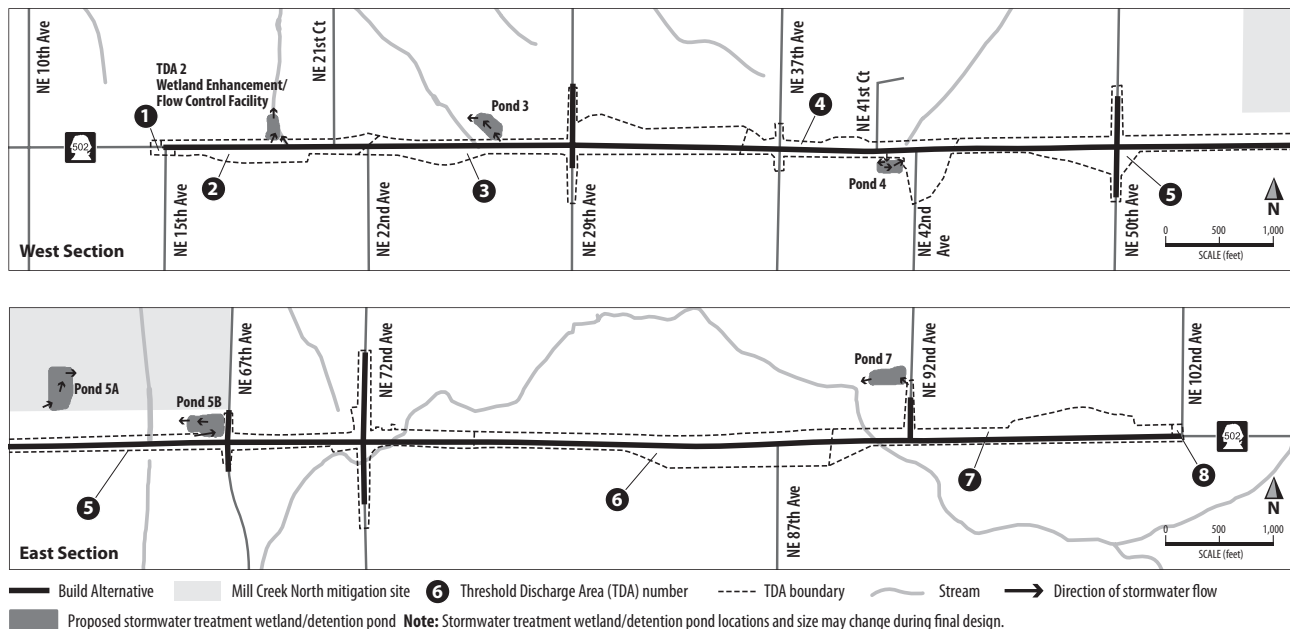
Stormwater treatment plan for the Build Alternative
